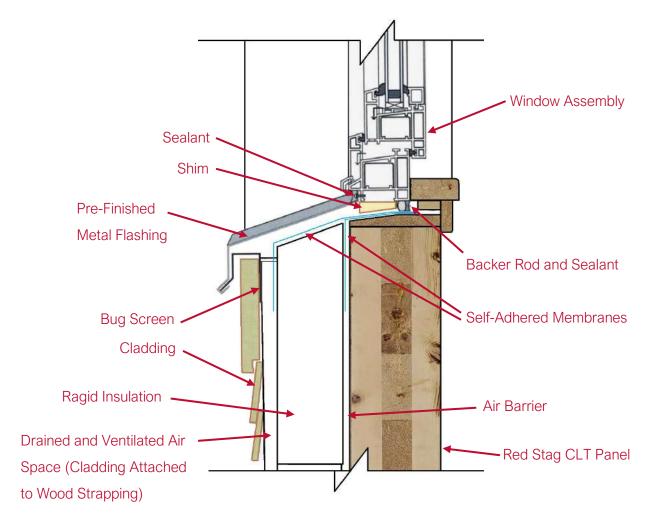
Red Stag CLT wall build-up for window and door openings [9].
